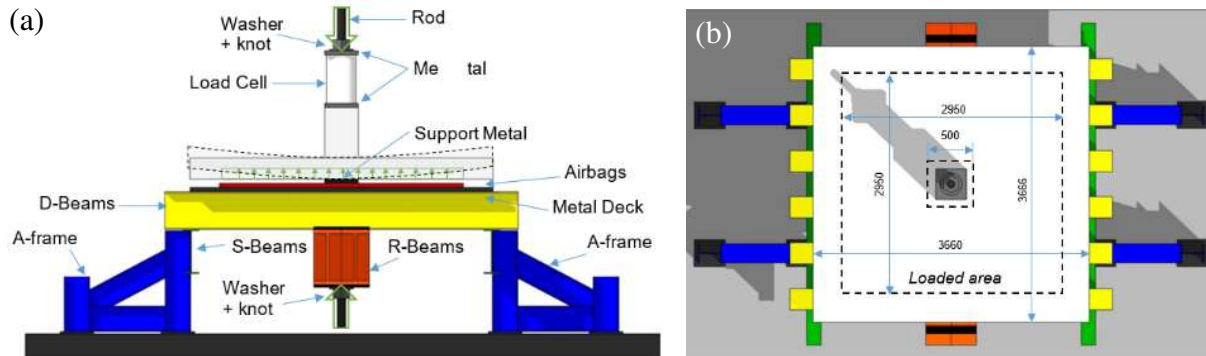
UL Test Setup: (a) front, (b) top view, dimensions (mm).
